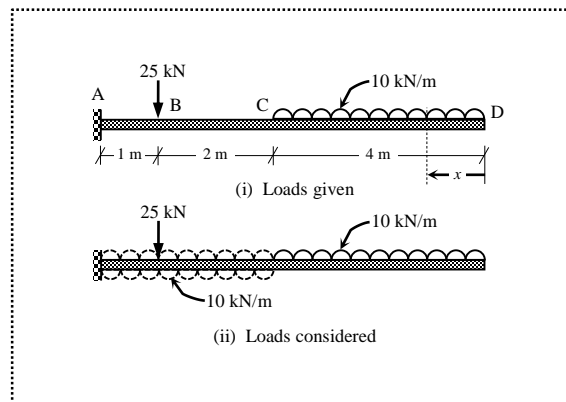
Cantilever beam with multiple loads (Example 2.13)
